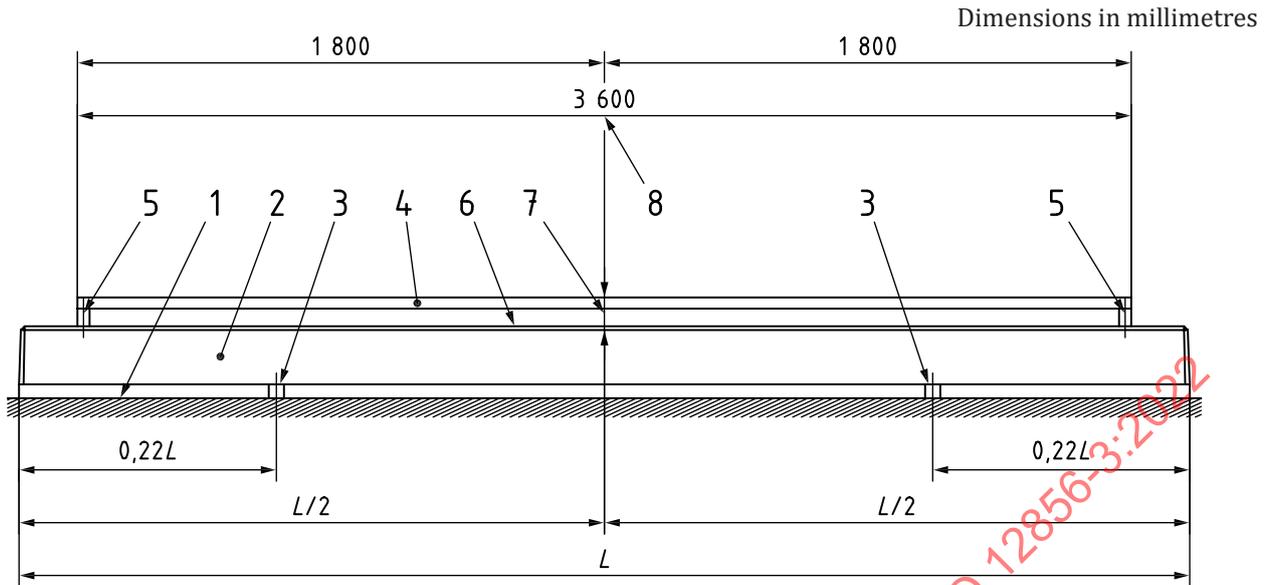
Measurement of tolerances on fastening components positioning of bearer
